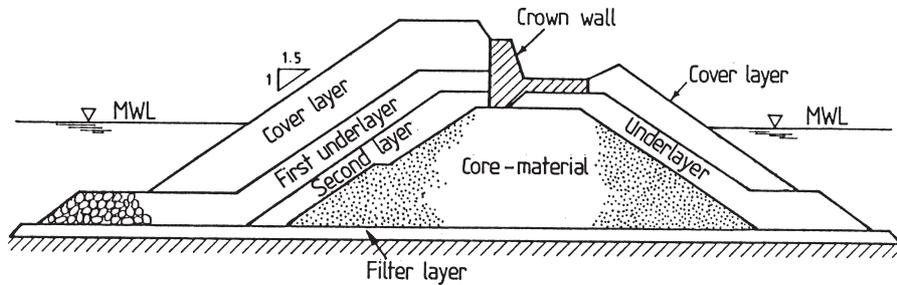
Typical Cross-section of a rubble-mound breakwater.
